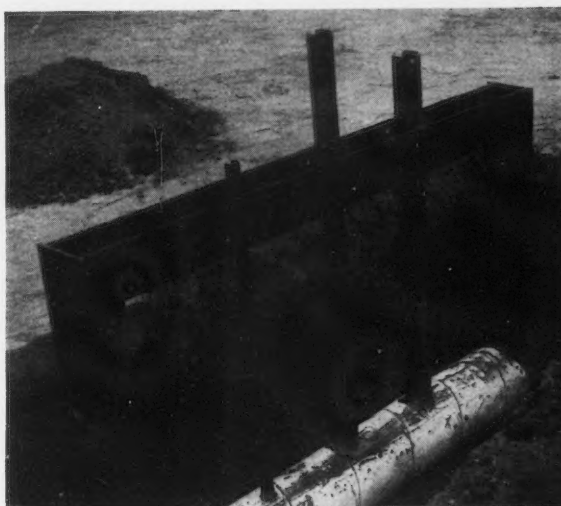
B—Excavation of pipe at penetration equipment showing attachment to pipe.
